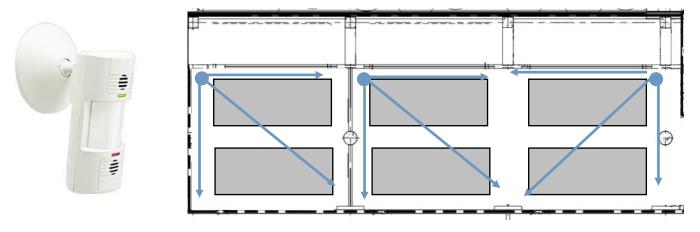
| Corner-Mounted Occupancy Sensor Layout - Fitness Center RCP
